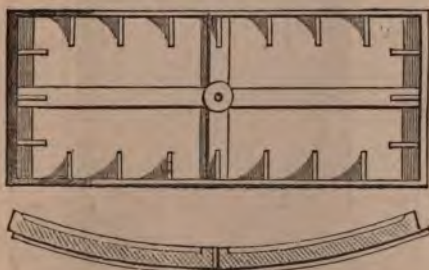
SECTION AND BACK ELEVATION OF CAST-IRON TUBBING.
